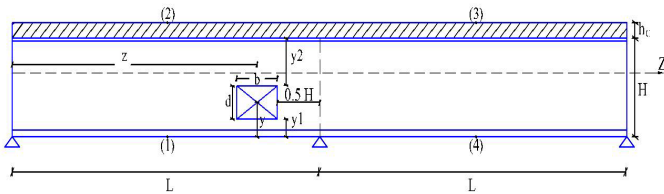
Elevation of continuous composite girder with rectangular opening in steel web
